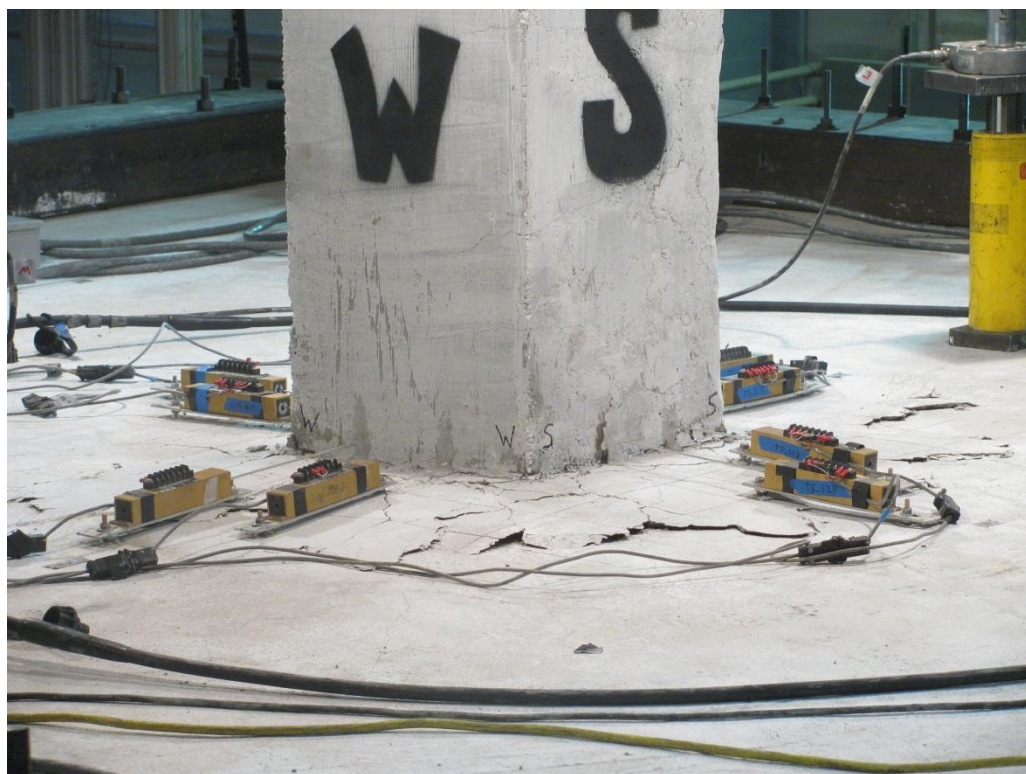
Specimen B3 – Connection Damage at 2.30% Drift, Point 1-2
